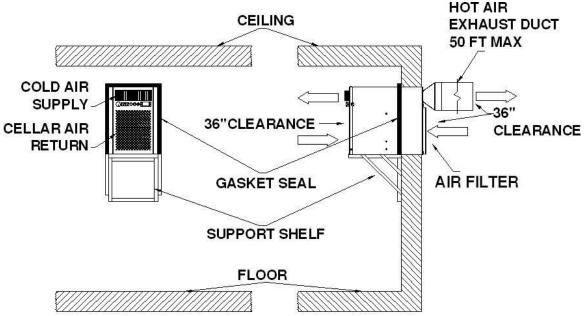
Flush to the outside of wall with hot-air exhaust duct & air filter
